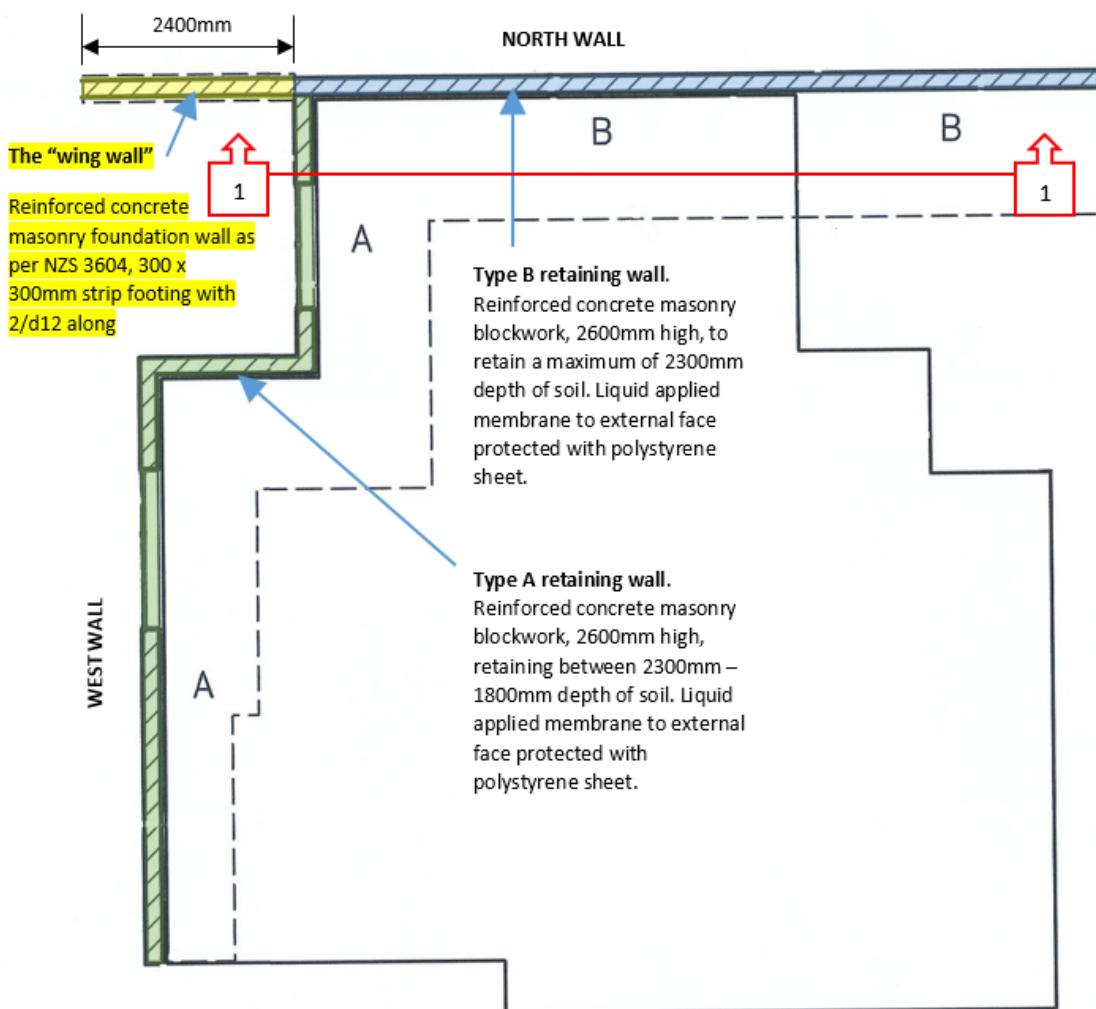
Retaining wall setting out (note to scale)⁴⁰
